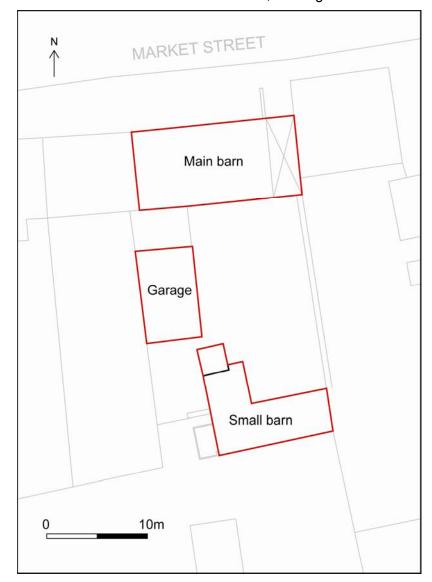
Plan of the current layout of the main barn and associated outbuildings
